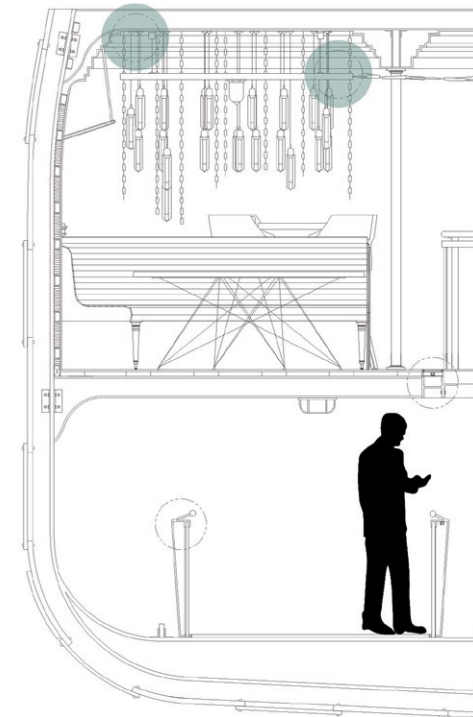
Acoustic Construction Detail (Author, 2016)
